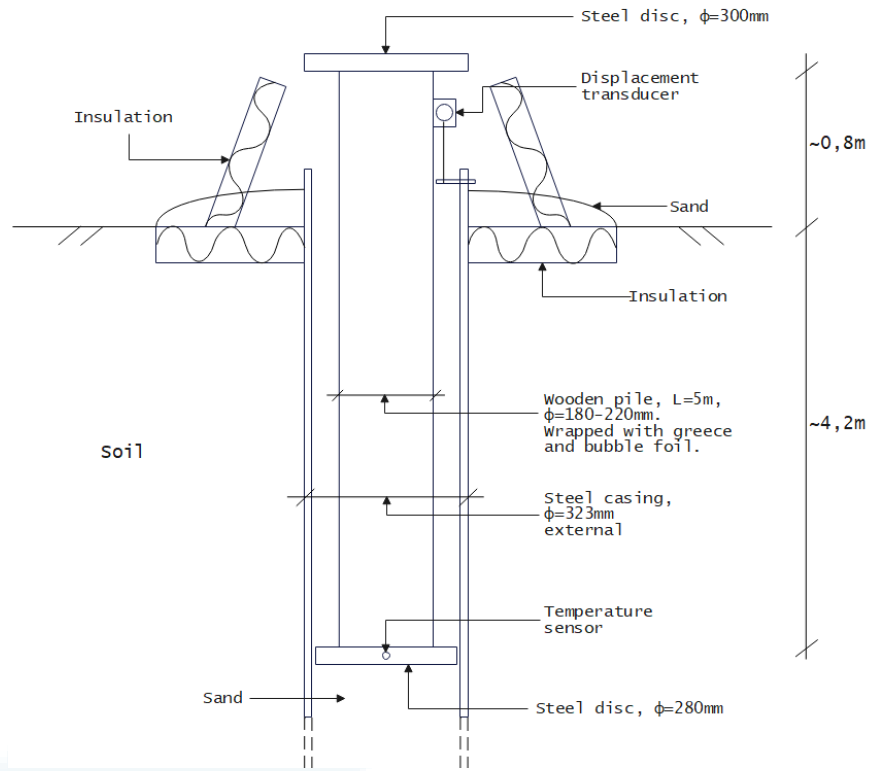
Illustrated profile of the plate loading test (Farnes, 2023)
